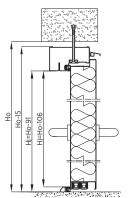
Installation of a single-leaf door to a masonry wall – internal frame with a thermal break – vertical cross-section
